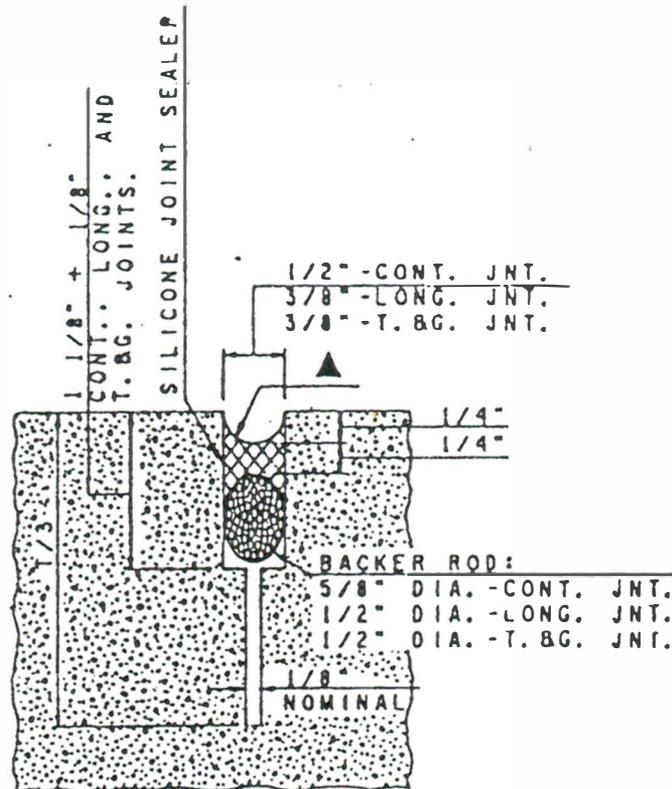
Cross Section of Backer Rod and Joint Sealant in Saw Cut.
